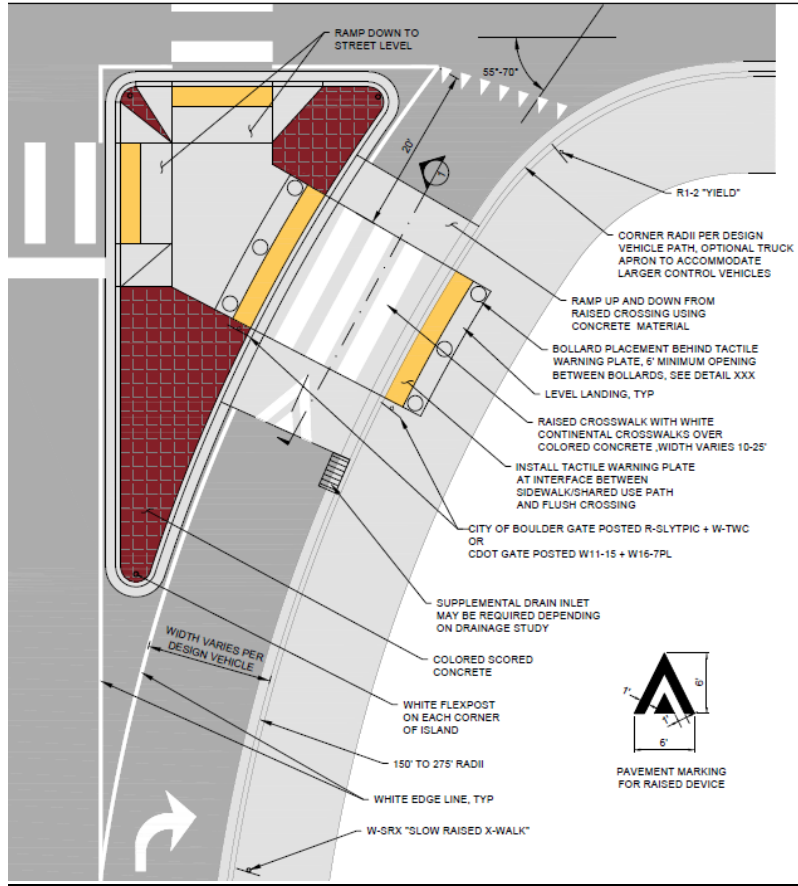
Typical Layout of Raised Crossing at Channelized Right Turn Location
